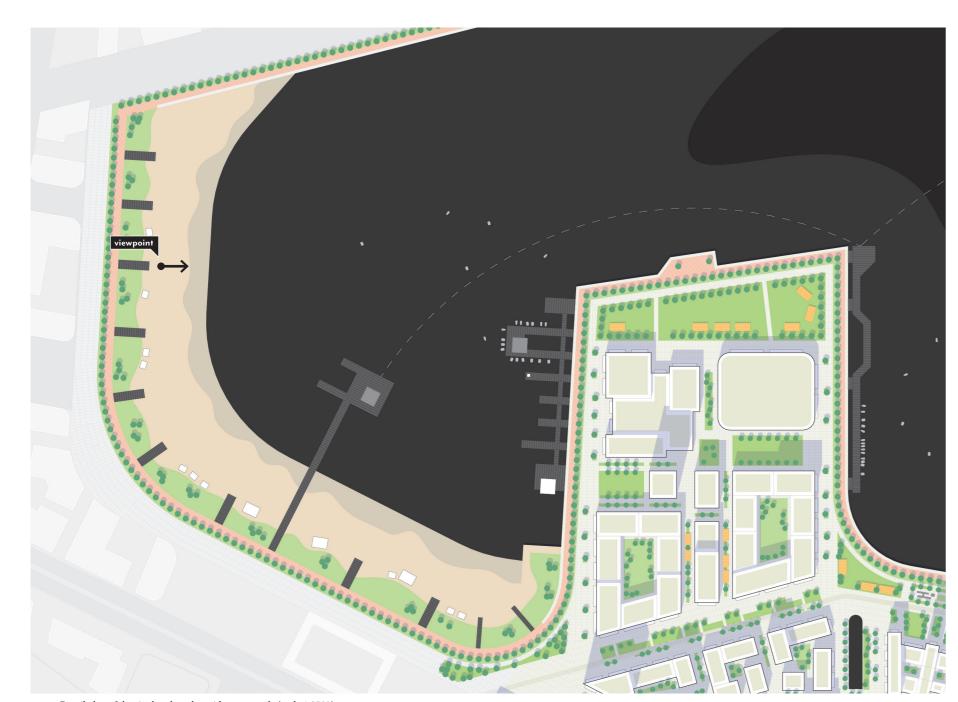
Detail plan of the city beach and seaside promenade (scale 1:2500).
